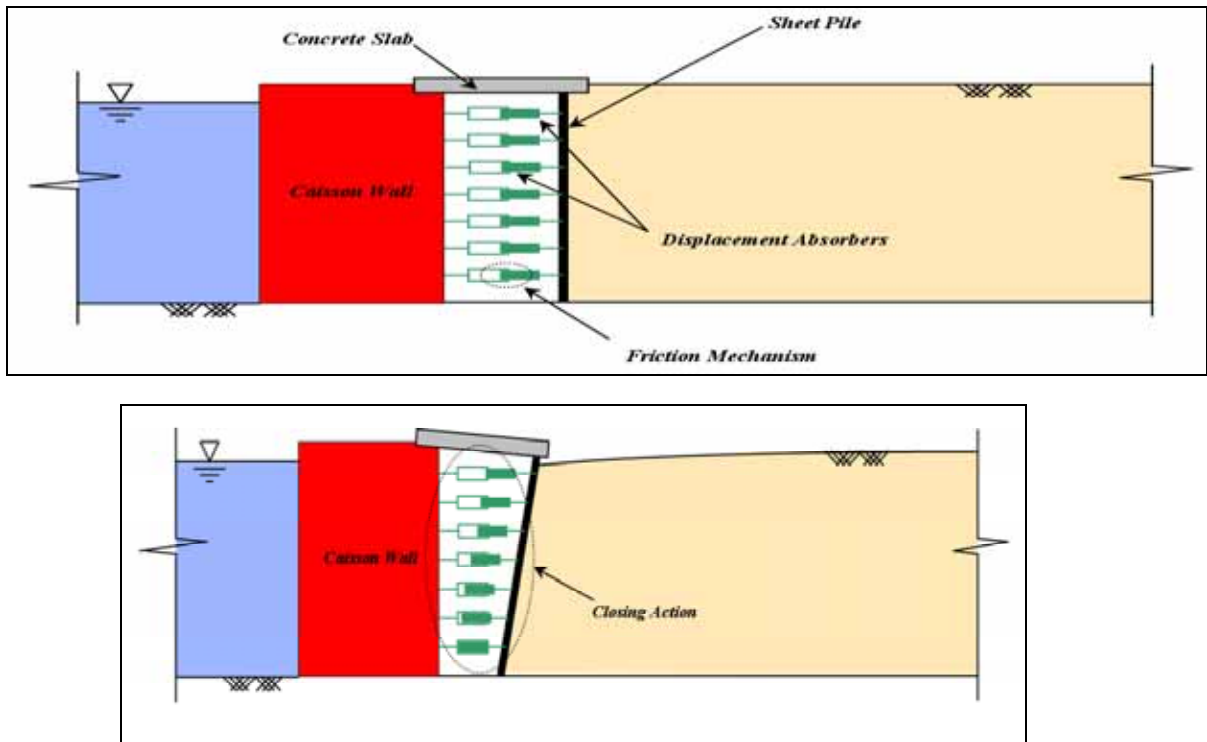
Schematic view of the application of sheet pile wall with Pressure Dissipater Elements (PDEs) behind the quay wall: (a) Undeformed shape, (b) Deformed shape
